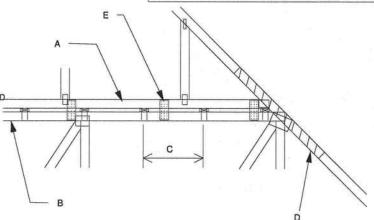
DETAIL IS NOT APPLICABLE FOR TRUSSES TRANSFERING DRAG LOADS (SHEAR TRUSSES). ADDITIONAL CONSIDERATIONS BY BUILDING ENGINEER/DESIGNER ARE REQUIRED.
